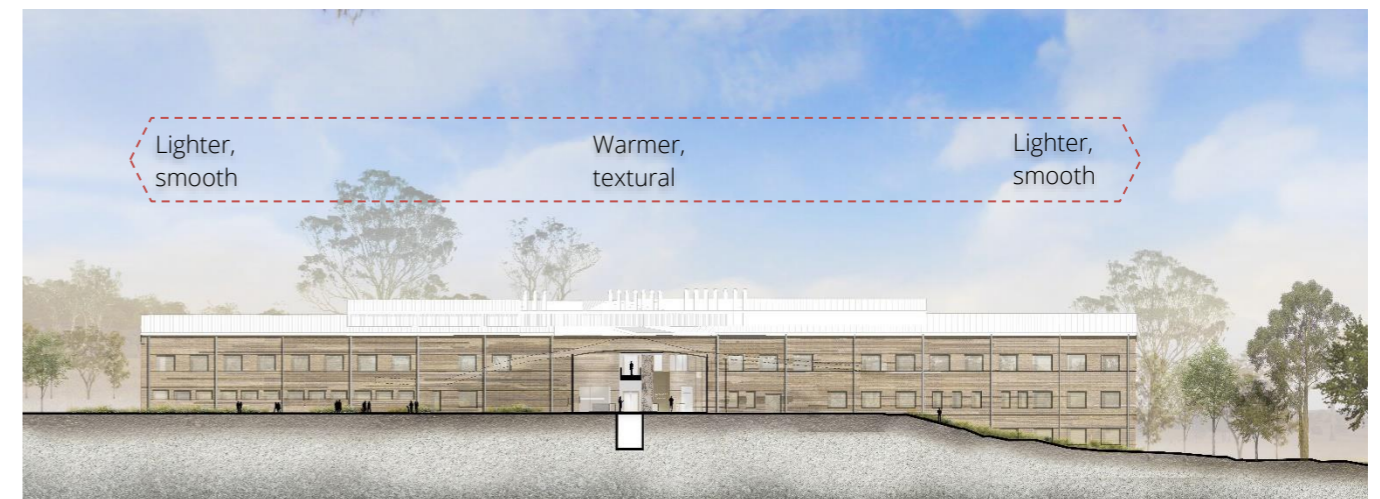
ELEVATION – WALAWAANI FAÇADE SKIN – NORTH ELEVATION OF SOUTHERN WING
